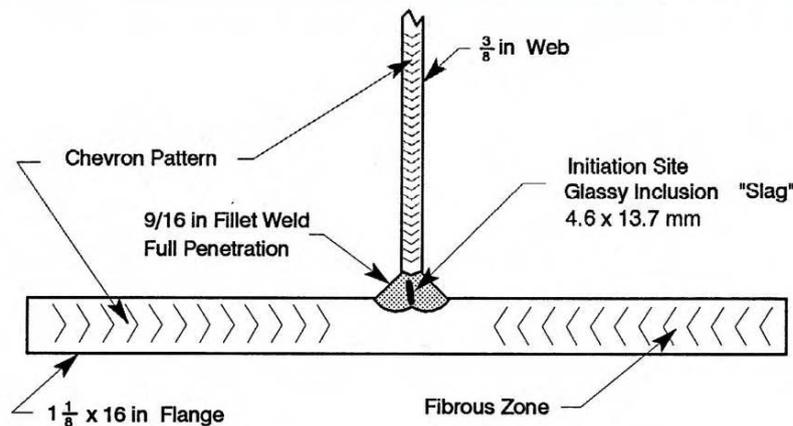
Girder flange fracture (FHWA-IF-13-020)
